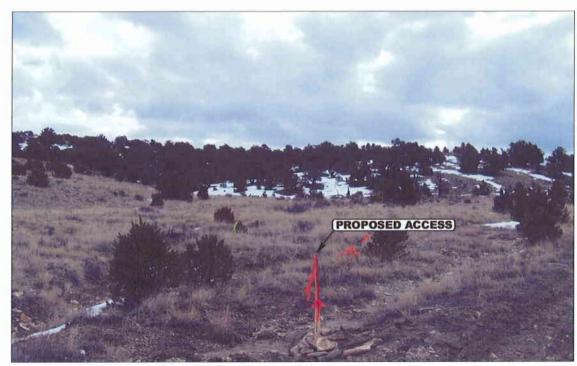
PHOTO: VIEW FROM BEGINNING OF PROPOSED ACCESS
